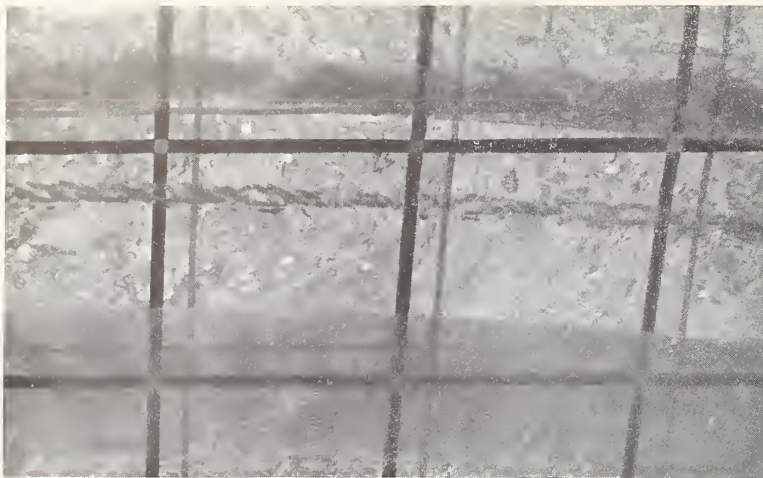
Inlaid felt base on concrete subfloor (test panel 11-R).
